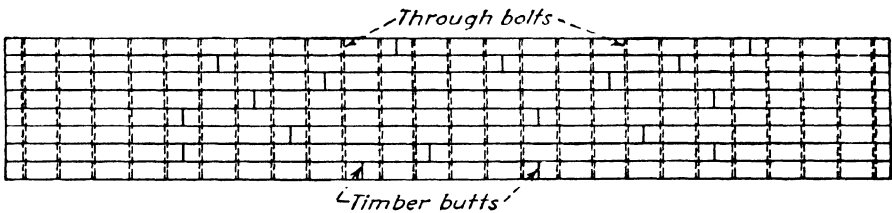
Arrangement of timber butts in constructing ground ways.
